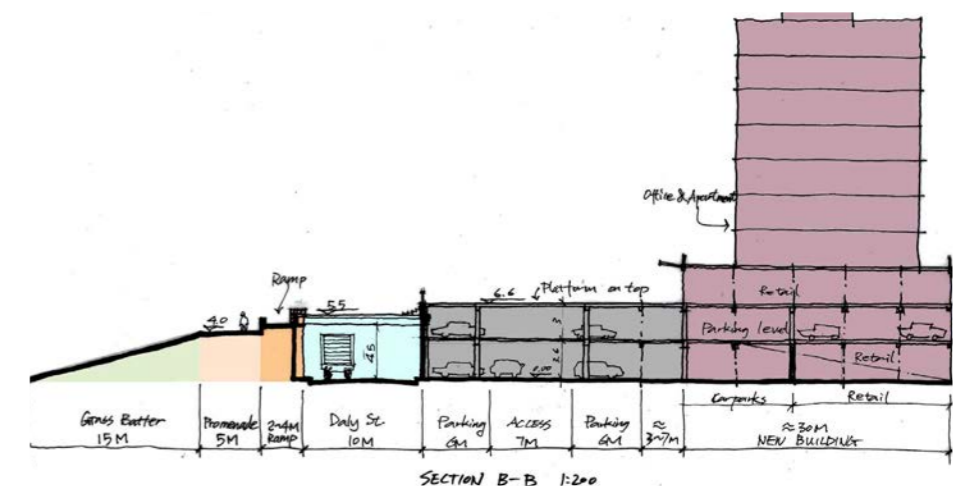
Indicative cross section - relationship of buildings to Daly Street
